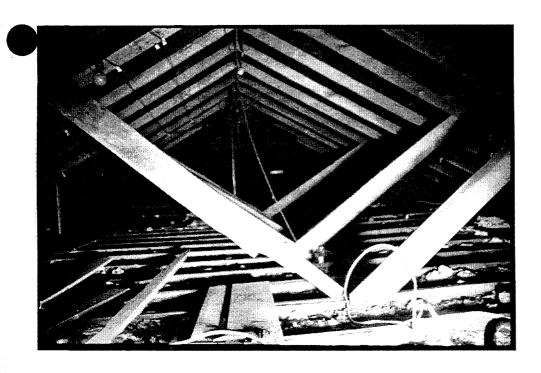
FRAM-ING AT WEST WING ATTIC
